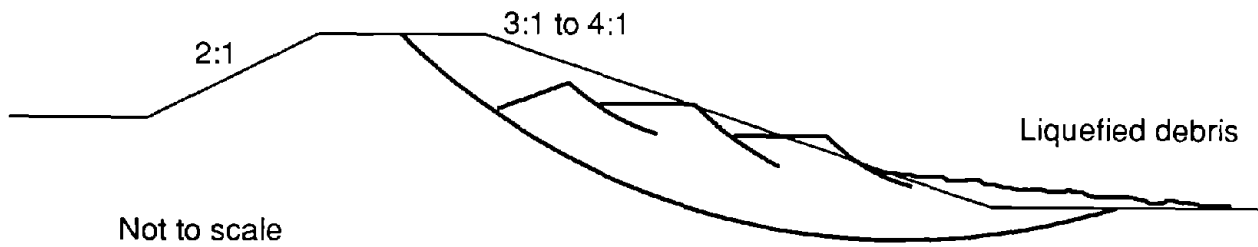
Schematic of Slope Failure Geometry at Quarry Embankment
